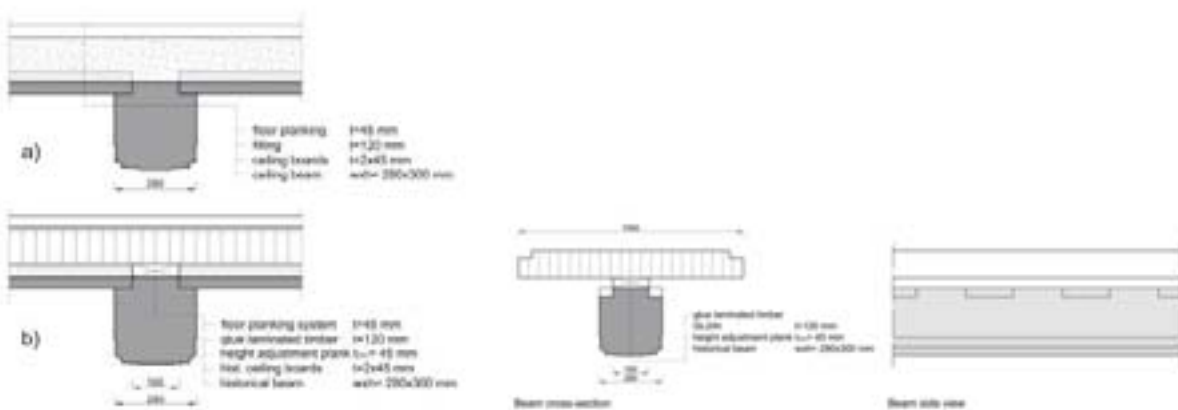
Ceiling beams a) historical b) reinforced [5]
